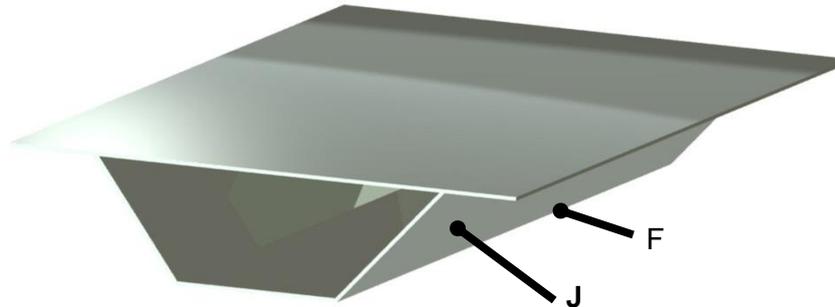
Metallic box girder bridge with indication of possible areas for upgrading. F – global bearing capacity or stiffness; J – shear bearing or buckling.
